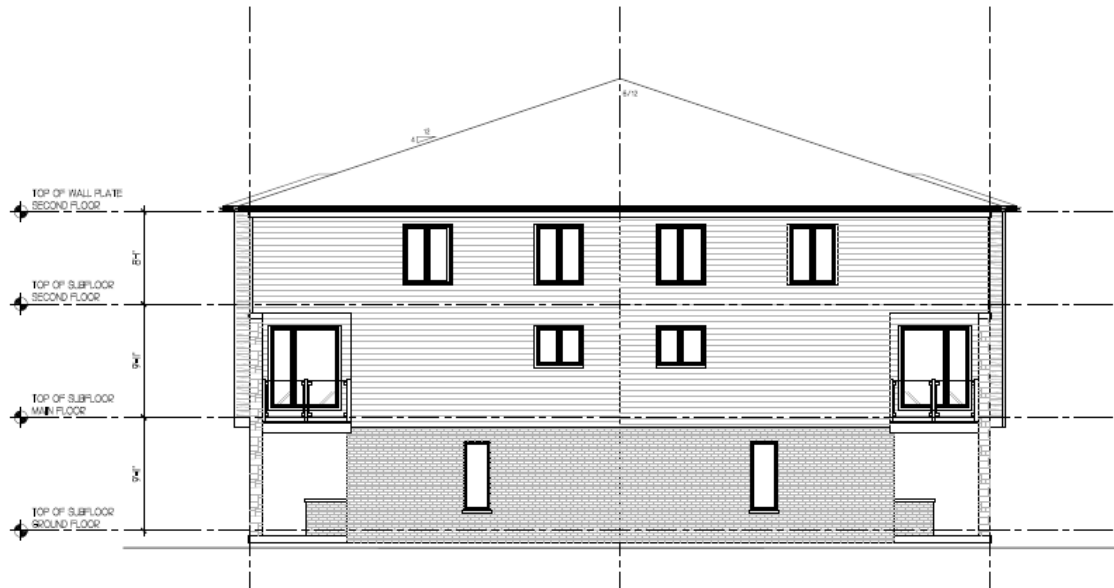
Front Elevation – 3-Storey B2B Townhouses (prepared by Orchard Design Studio Inc.)
